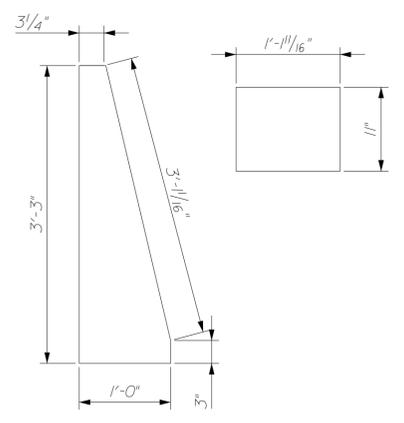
FLOORBEAM KNEE BRACE TYPE A PLATE
